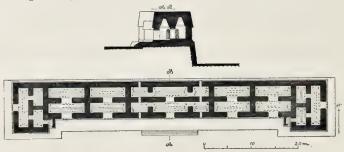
Tikal: Plan and Section of Palace with Twenty Chambers.
